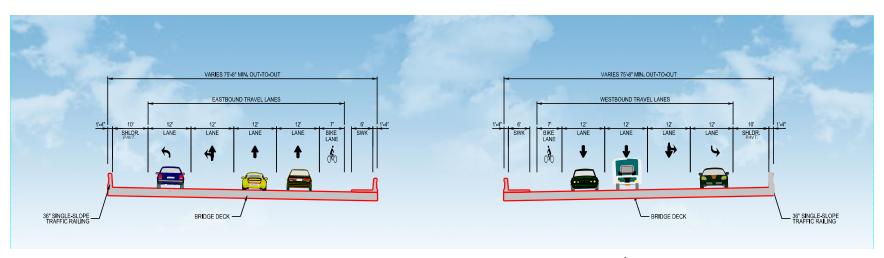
Typical Section - Lantana Road Bridge Over SR 9/I-95
